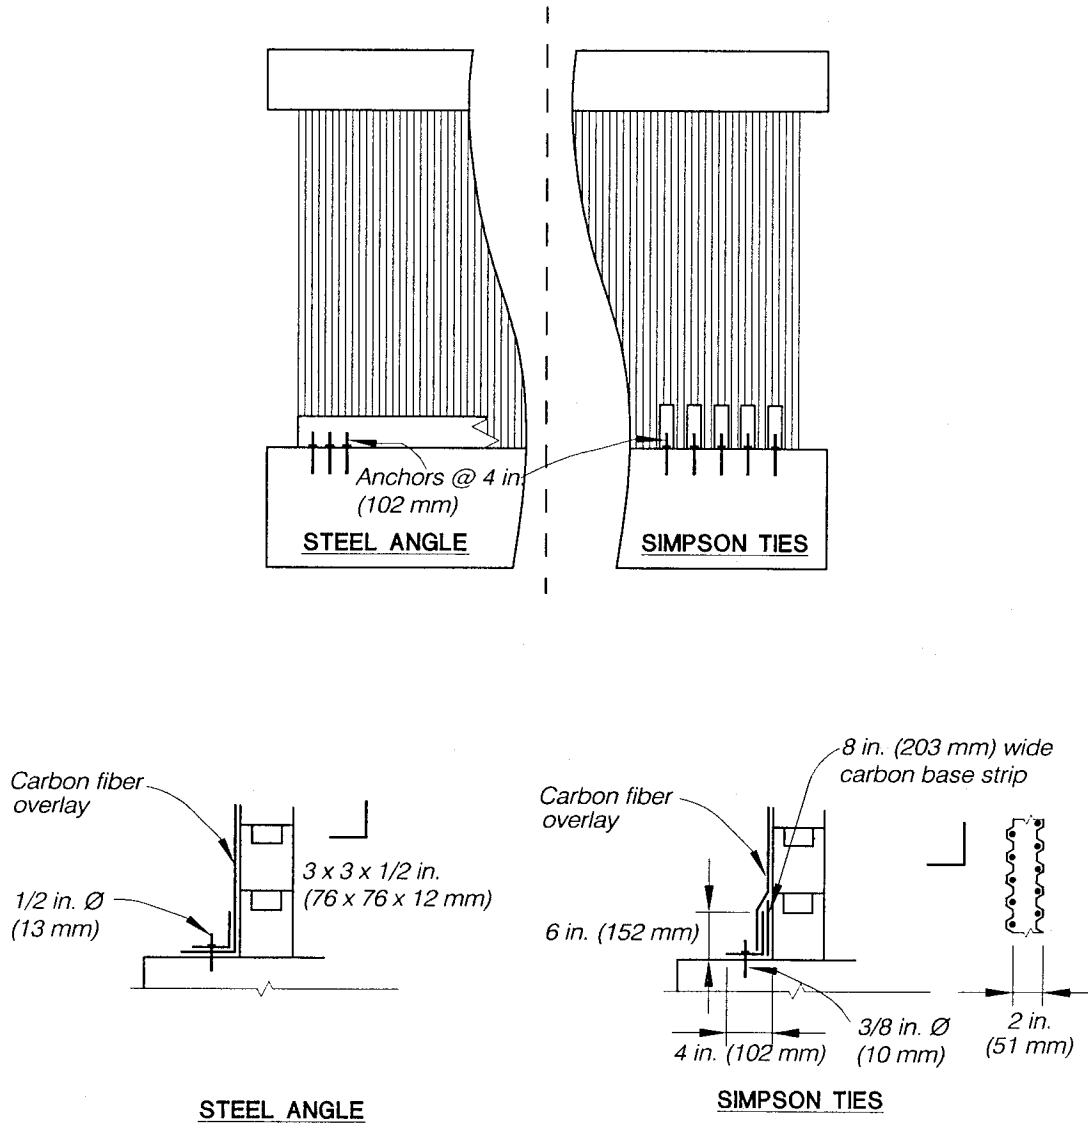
Carbon Fiber Overlay to Enhance Flexural Capacity of Masonry Wall
